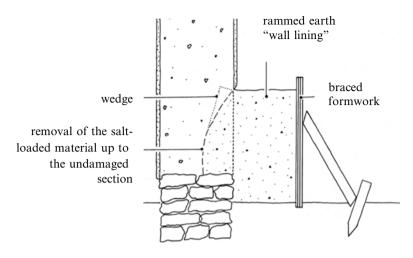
Repair of rammed earth and cob walls: repair of the wall base using a rammed earth mix [71]
